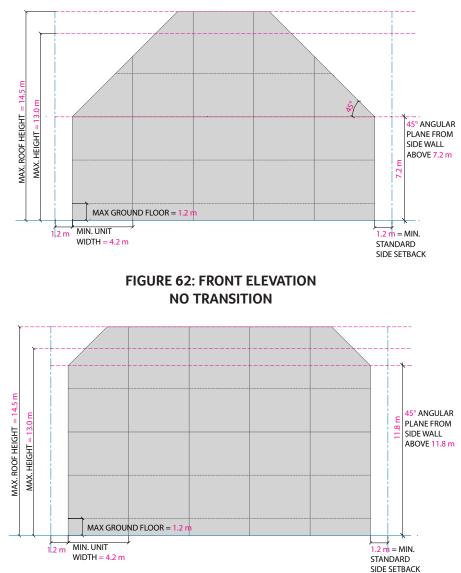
FRONT ELEVATION WITH TRANSITION
